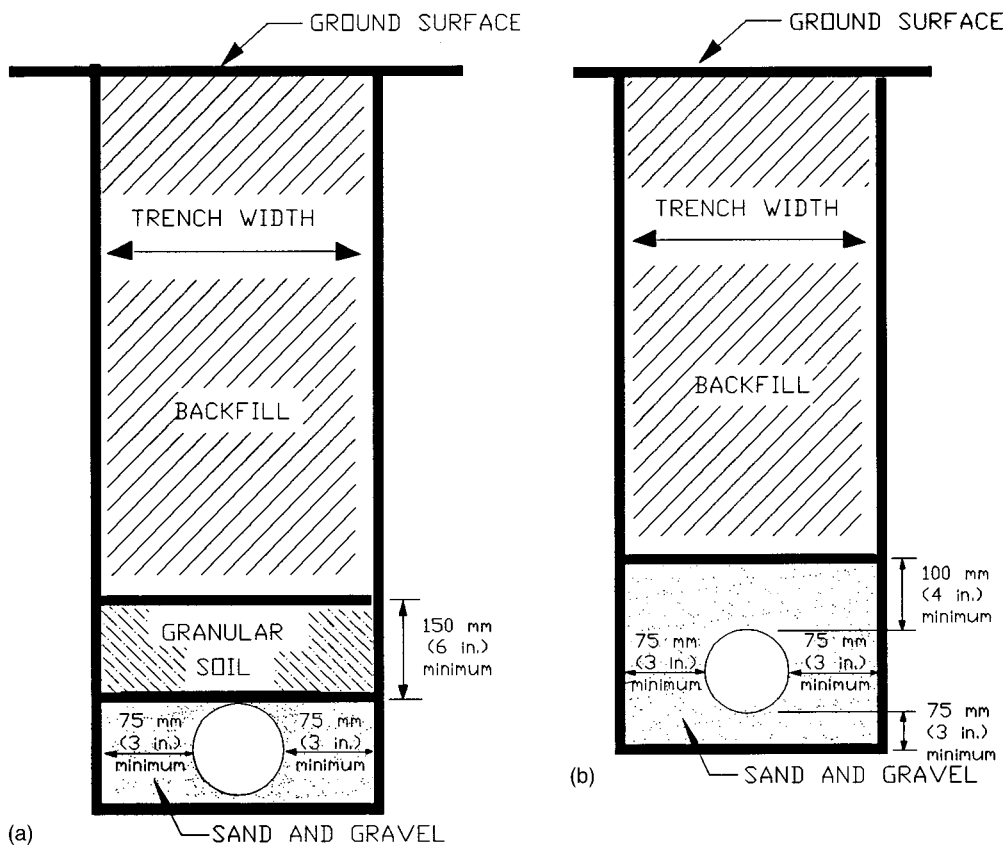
(a) Corrugated plastic tubing encased in a sand and gravel envelope designed to reduce soil loading on the pipe. (b) Corrugated plastic tubing encased in a sand and gravel envelope designed as a filter to prevent soil particles from entering the pipe and/or as an envelope to increase water flow from the soil into the pipe
